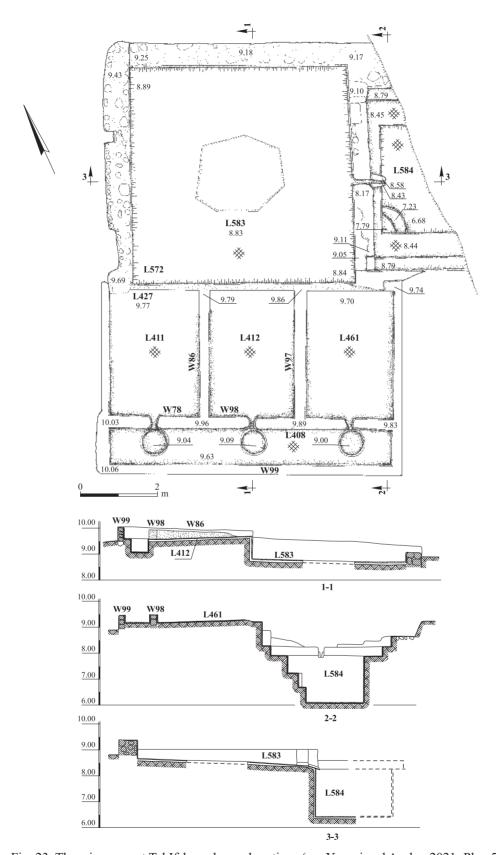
The winepress at Tel Ifshar, plan and sections (see Yannai and Ayalon 2021: Plan 5).
